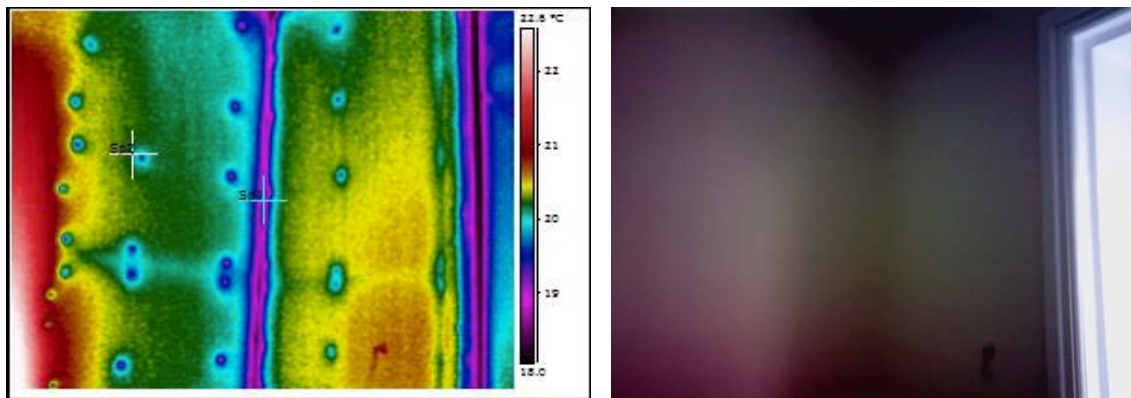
Room F10. First floor office. Thermal bridge at the junction of the external wall. It also shows the fixing points of the insulation panels. This pattern can be found all over the building.
